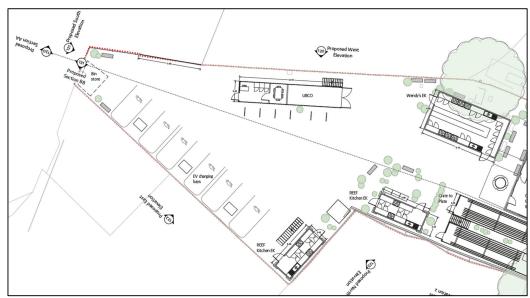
Extract of the Site Plan Showing the Cycle Parking Proposed
